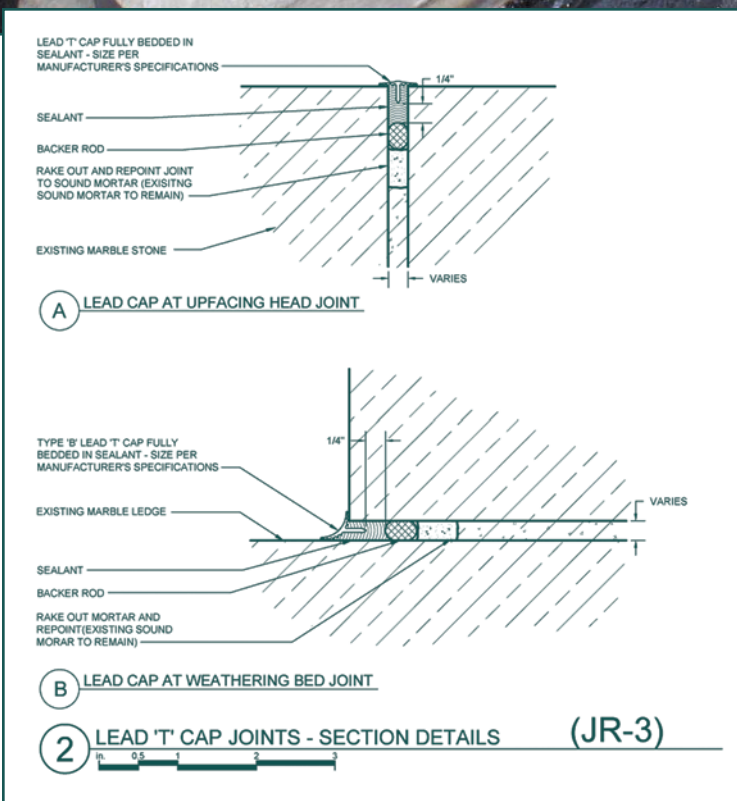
Detail of lead cap at horizontal and vertical joints.
